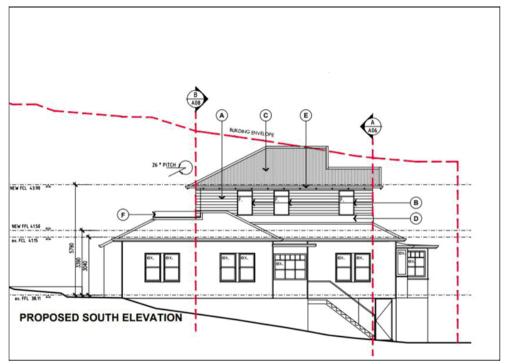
Proposed left hand side elevation, facing 110 Regent Street.
